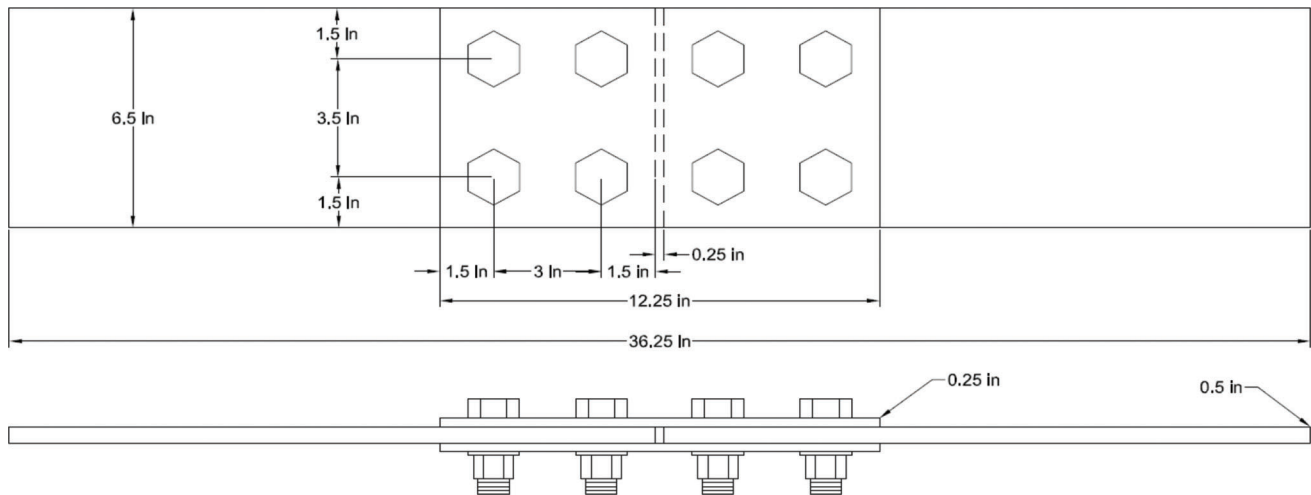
Dimensions of the 1/4-inch gap splice connection specimen.
